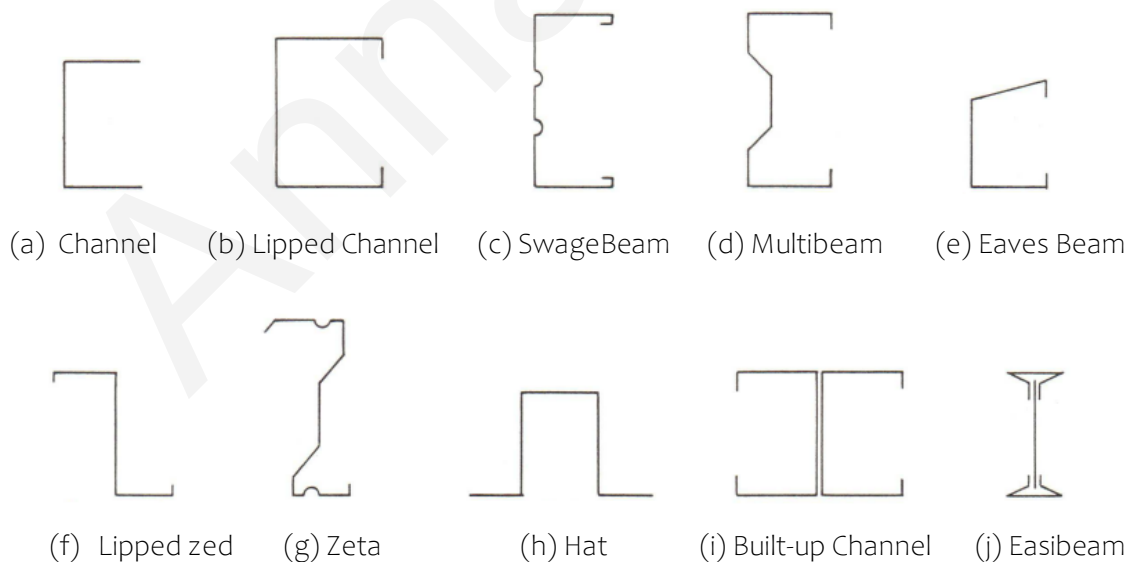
Examples of cold-formed steel cross-section profiles.
